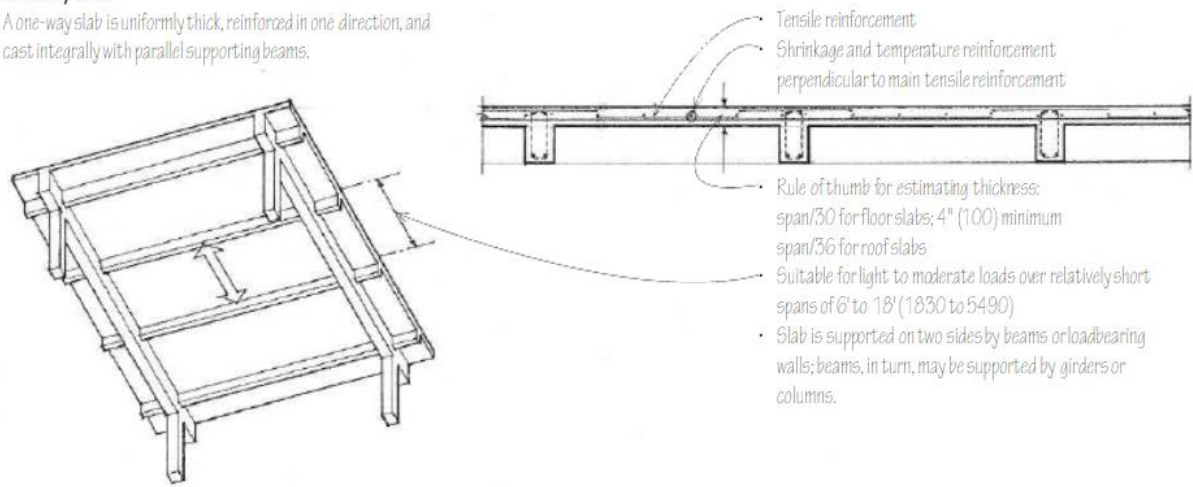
Architects and engineers utilize one-way slabs as a common structural system in building design (Ching, 2015).
